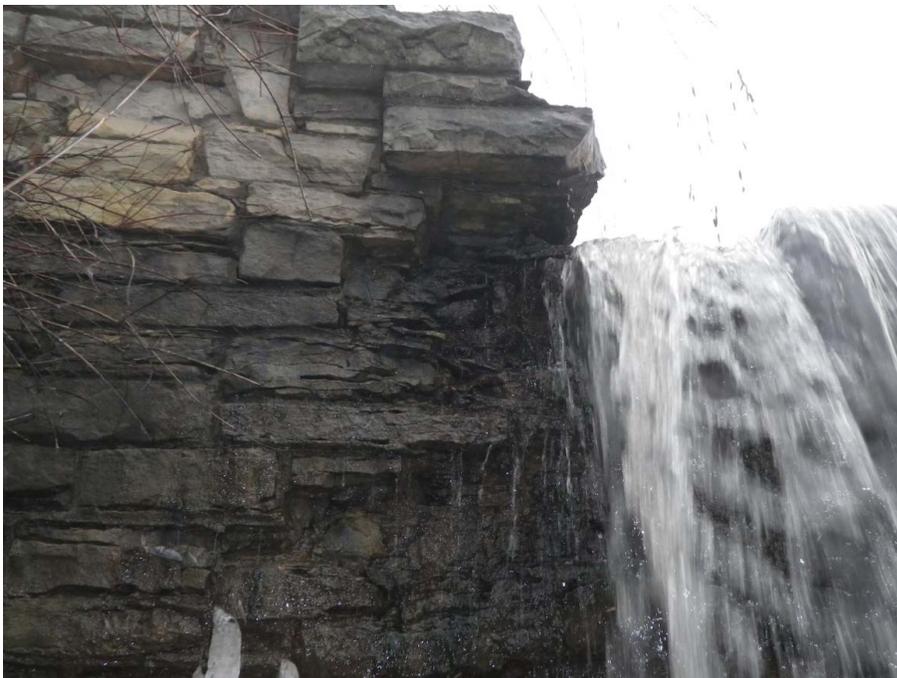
Right abutment downstream face at end of spillway. Note missing stone on spillway and weathered stone along edge
